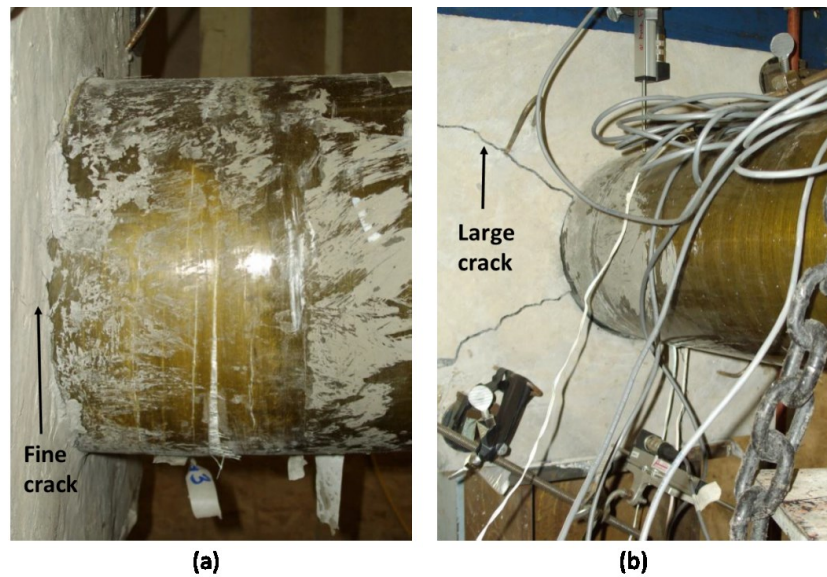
Second connection type: direct embedment of the precast CFFT into the footing (Sadeghian et al. 2011).
